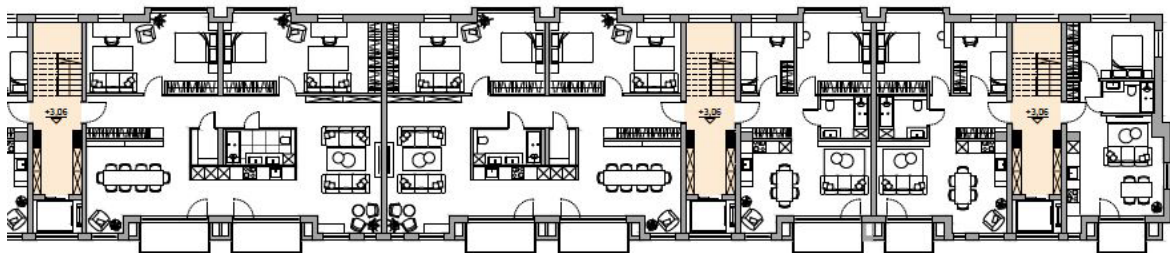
collective kitchen, eeting and living room on the first floor for everyone who lives in this portico, with two small apartments directly connected, sharing one bathroom (for less mobile elderly). There is an elevator.
